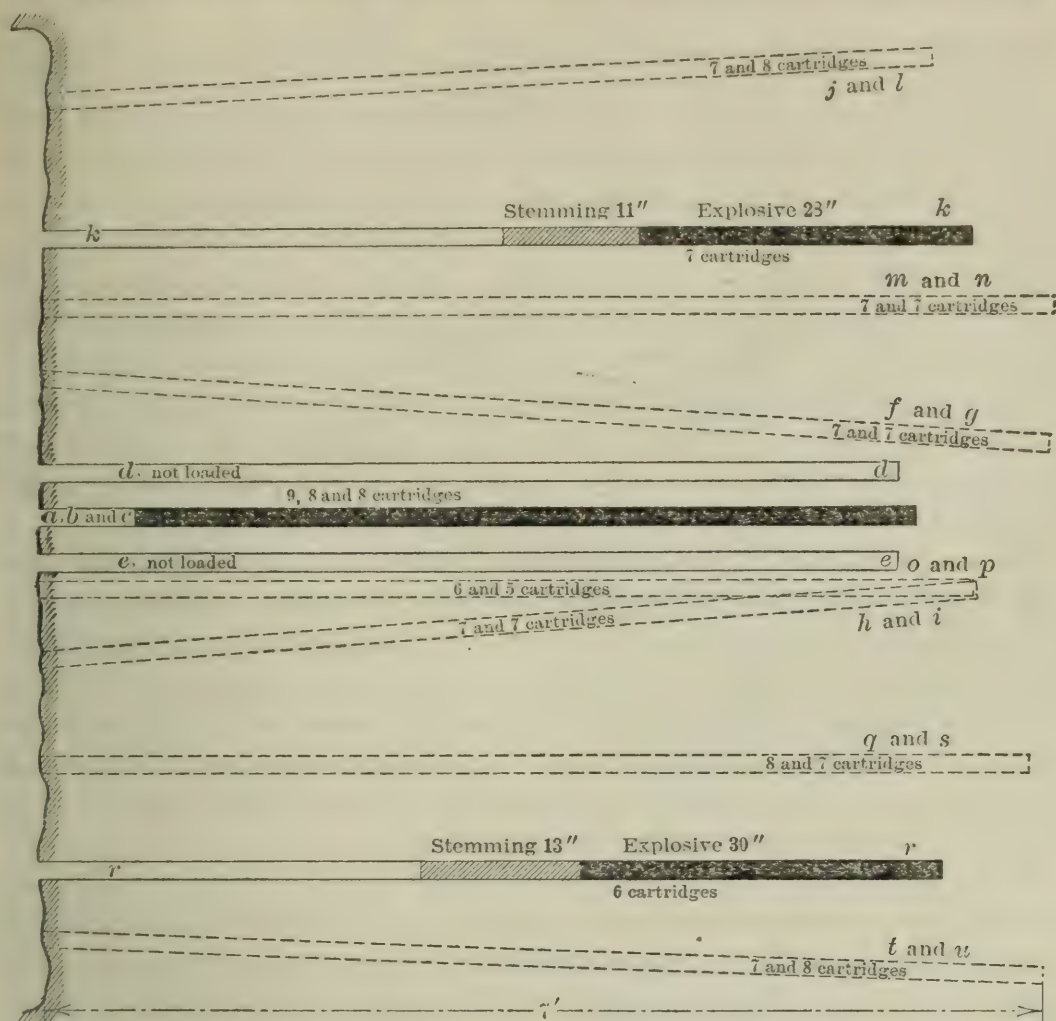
Arrangement of drill holes in experiments in a zinc mine. Section through face.
